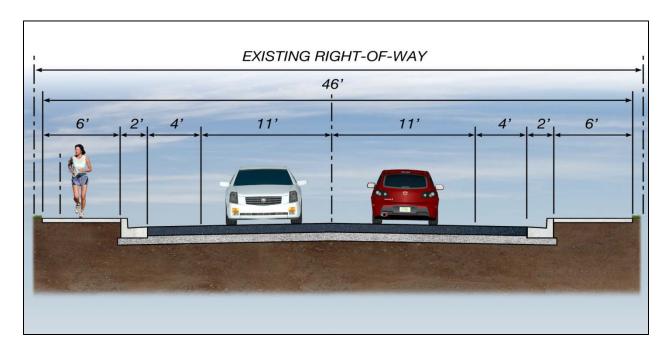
Proposed Roadway Section East of Proposed Movable Bridge
